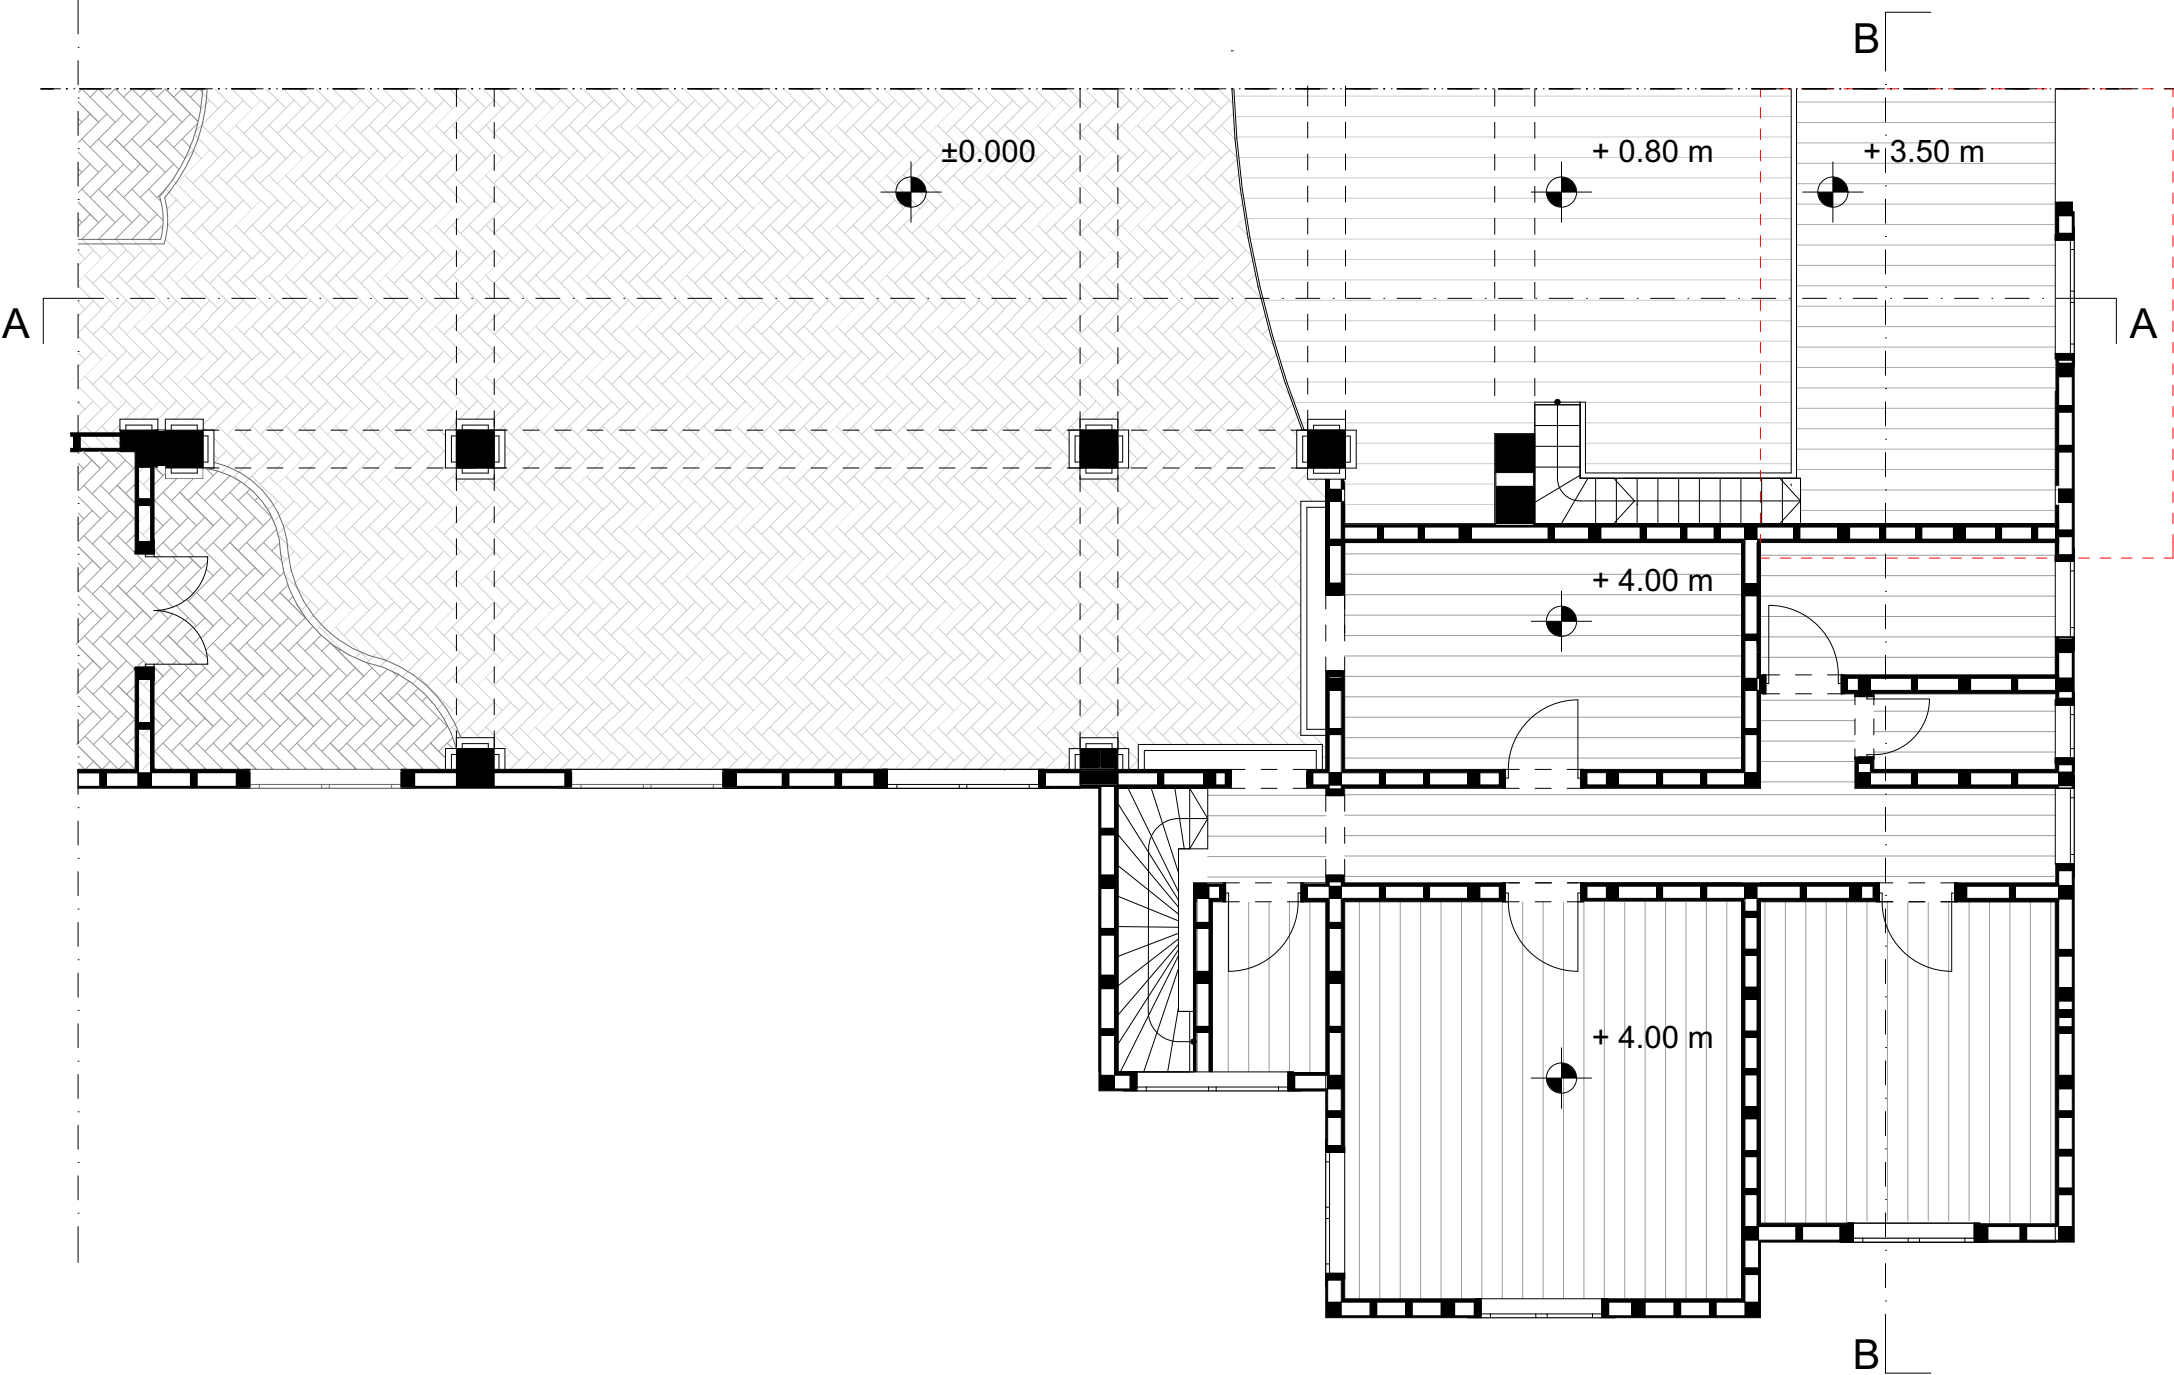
Ground Floor Plan (Source: Created by the author, 2024)
